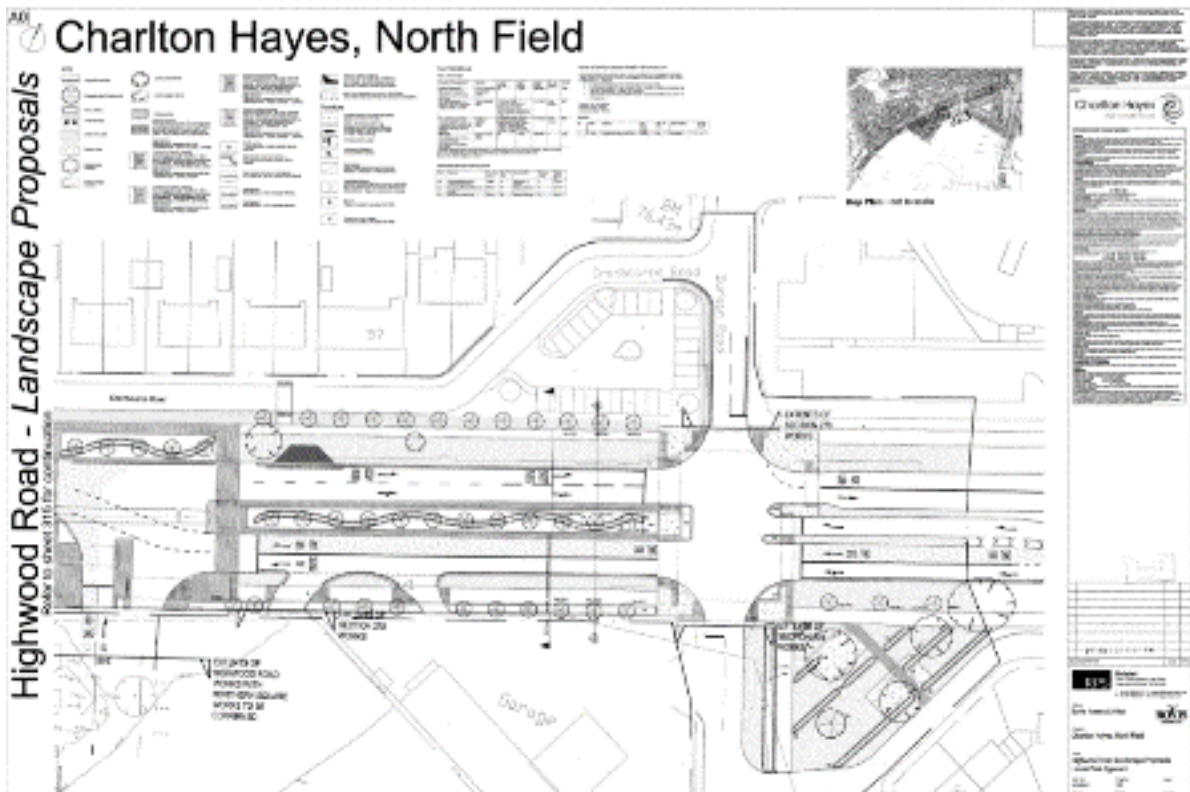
Linear Parkplan showing ‘wavy hedge’ detail in the centre.
